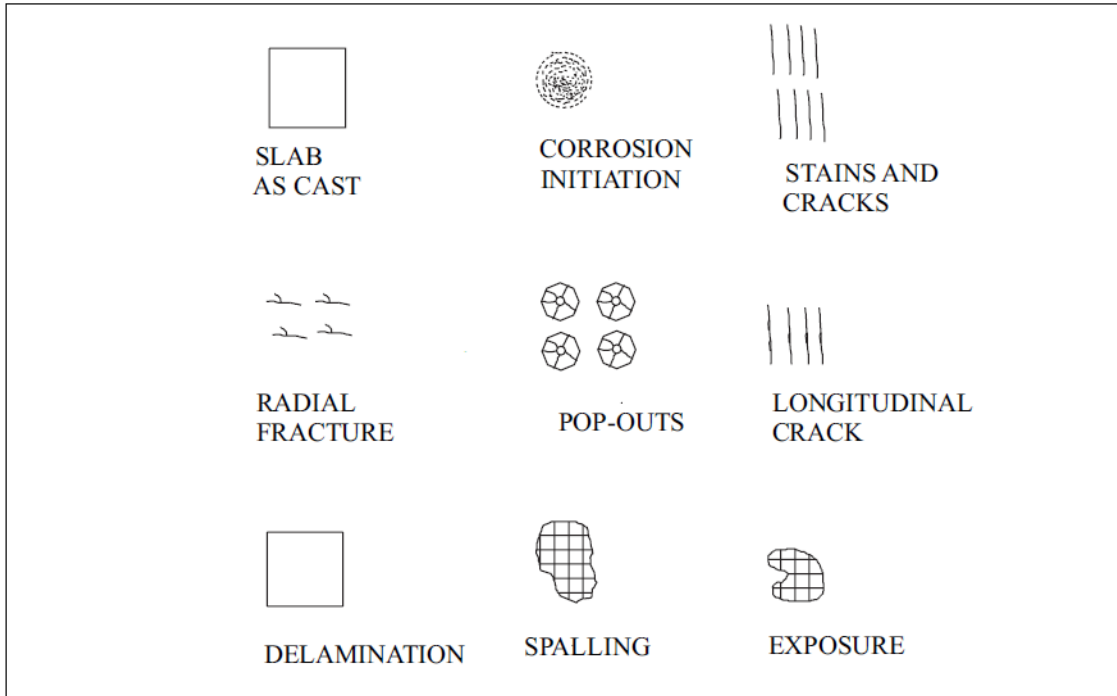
Symptoms of corrosion in a reinforced concrete slab
